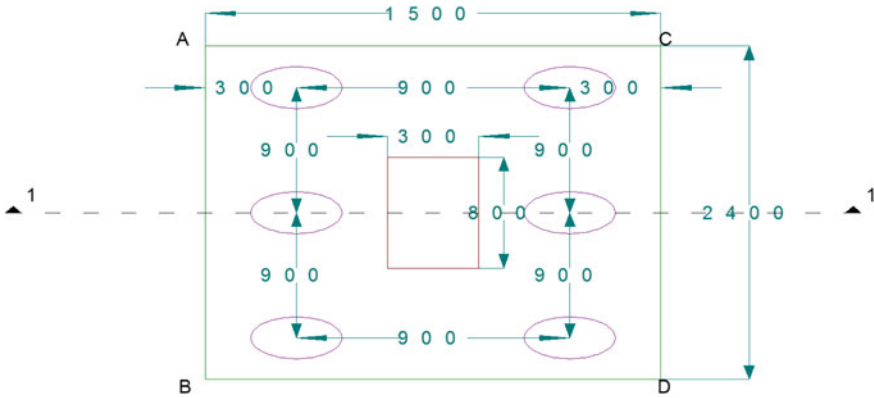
Micro-pile arrangement at the site of proposed extension of structure
